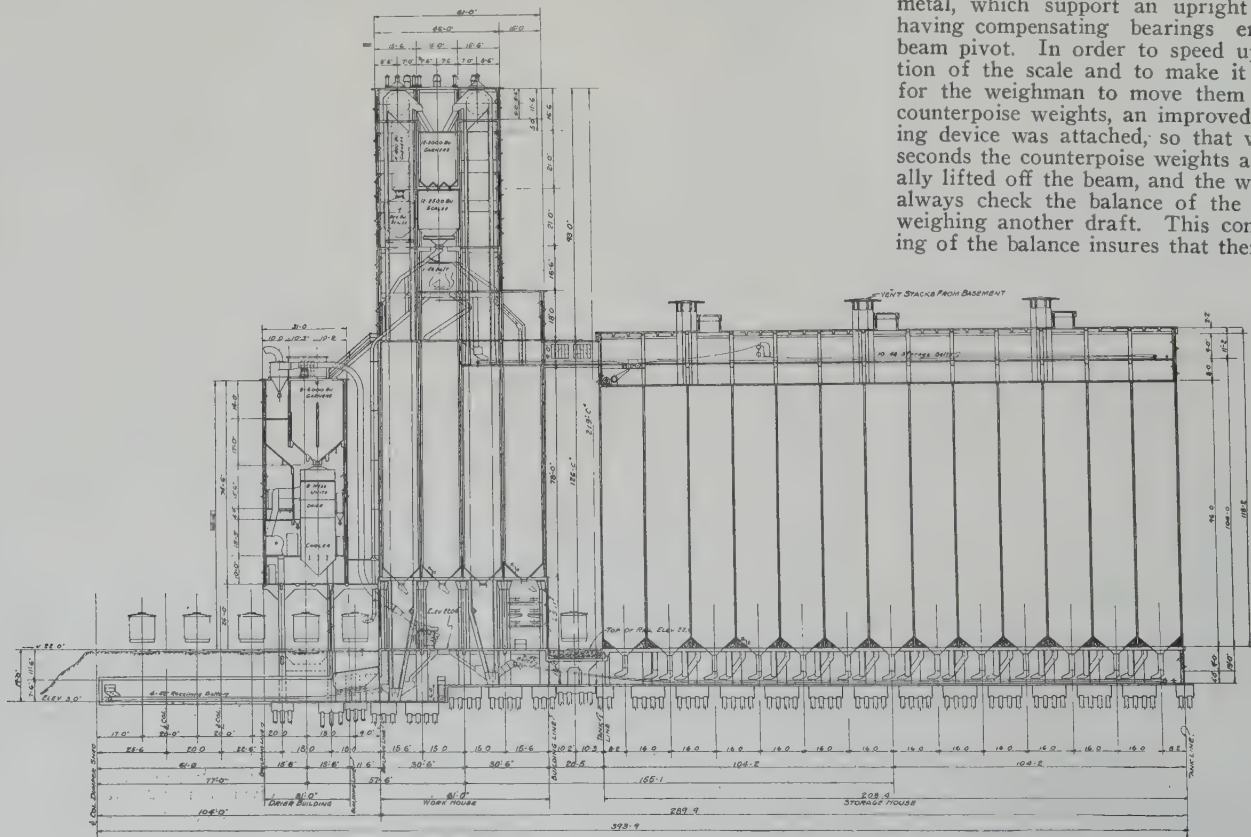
B. & O. Elevator. Longitudinal Sectional View of Track Shed, Drier House, Working House and Annex.
